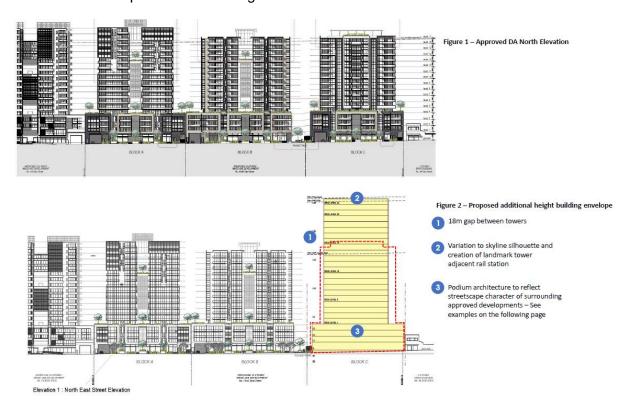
Extract from Urban Design Report showing approved DA and Planning Proposal scheme
